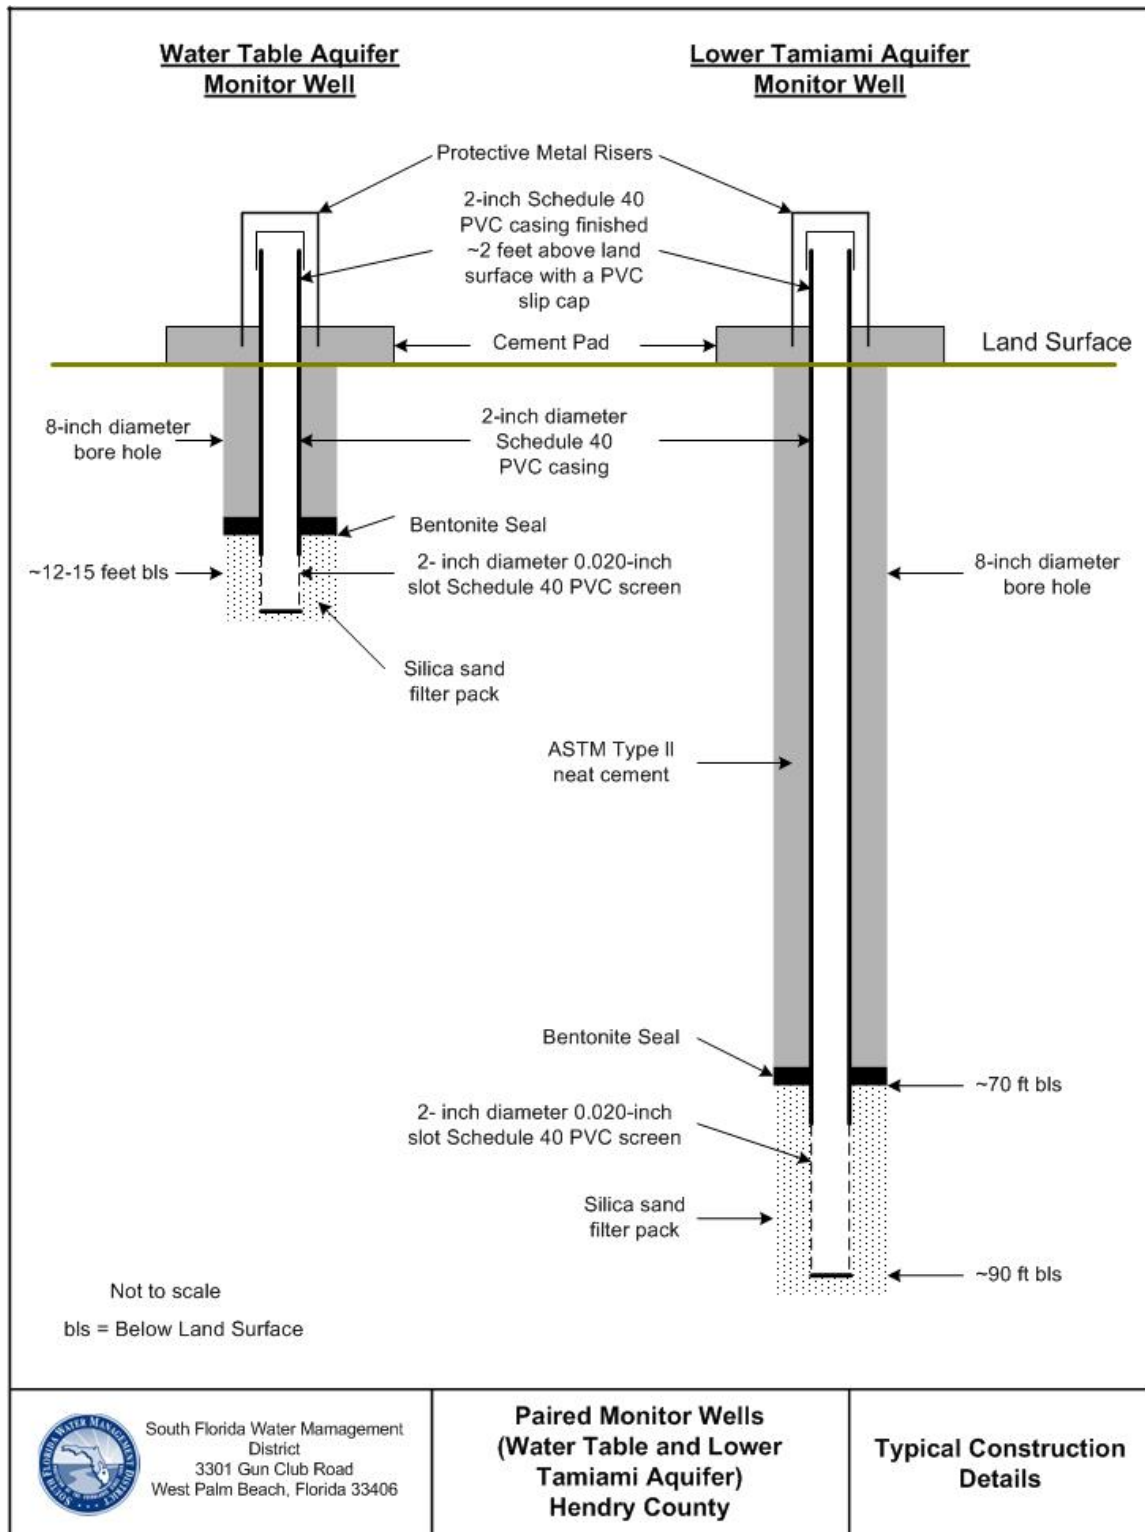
Typical well pair construction used at Crooks Ranch and Golden Ox Ranch.
